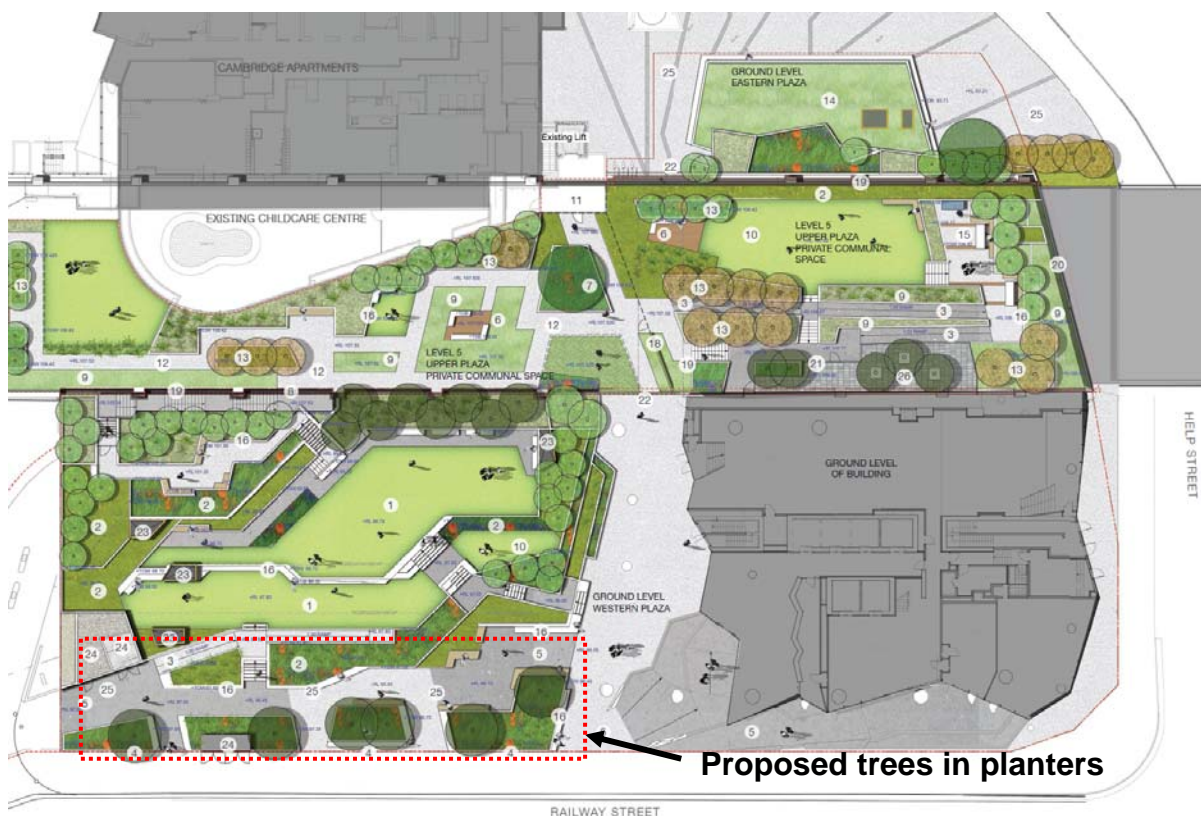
Existing Services in Railway Street and the zone required for tree planting (Source: Proponent's Modification Request)
